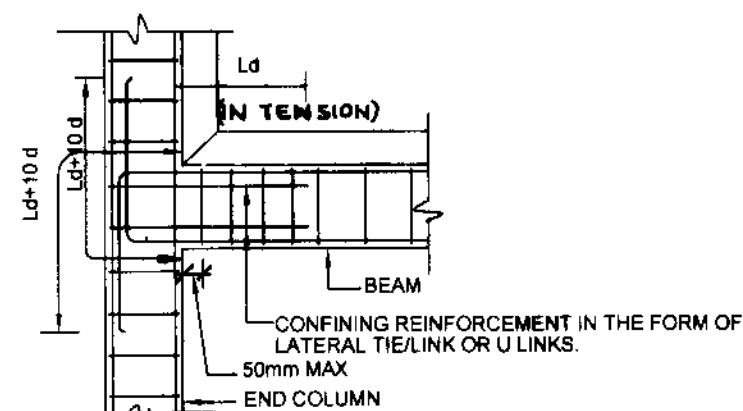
(b) :- TYPICAL DETAILS OF A BEAM-COLUMN
